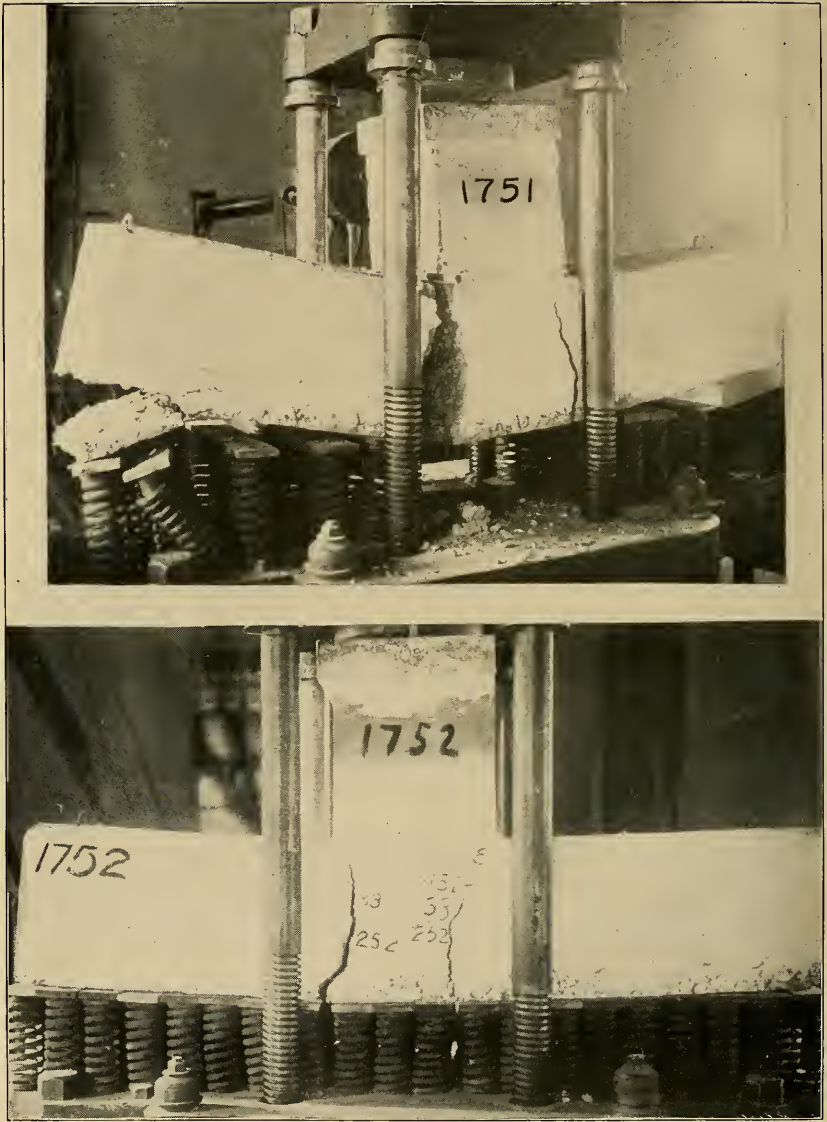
VIEWS OF REINFORCED CONCRETE WALL FOOTINGS AFTER TEST.
